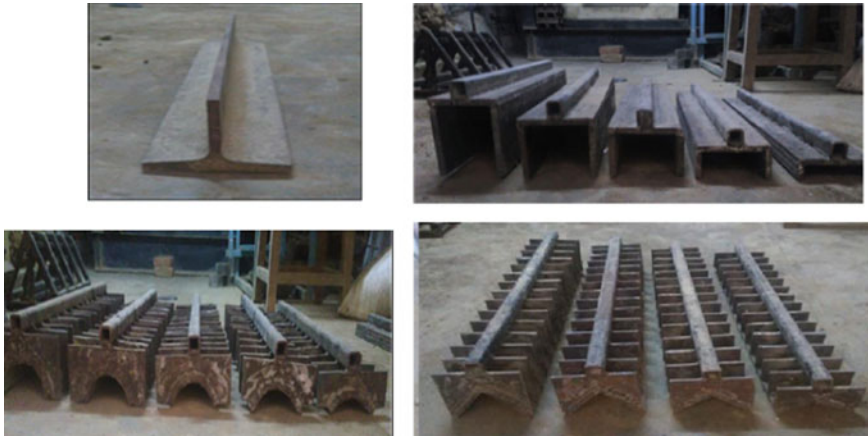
Model strip footings with flat base, with flanges, curved cross section and sloping cross section with various (d/B)
